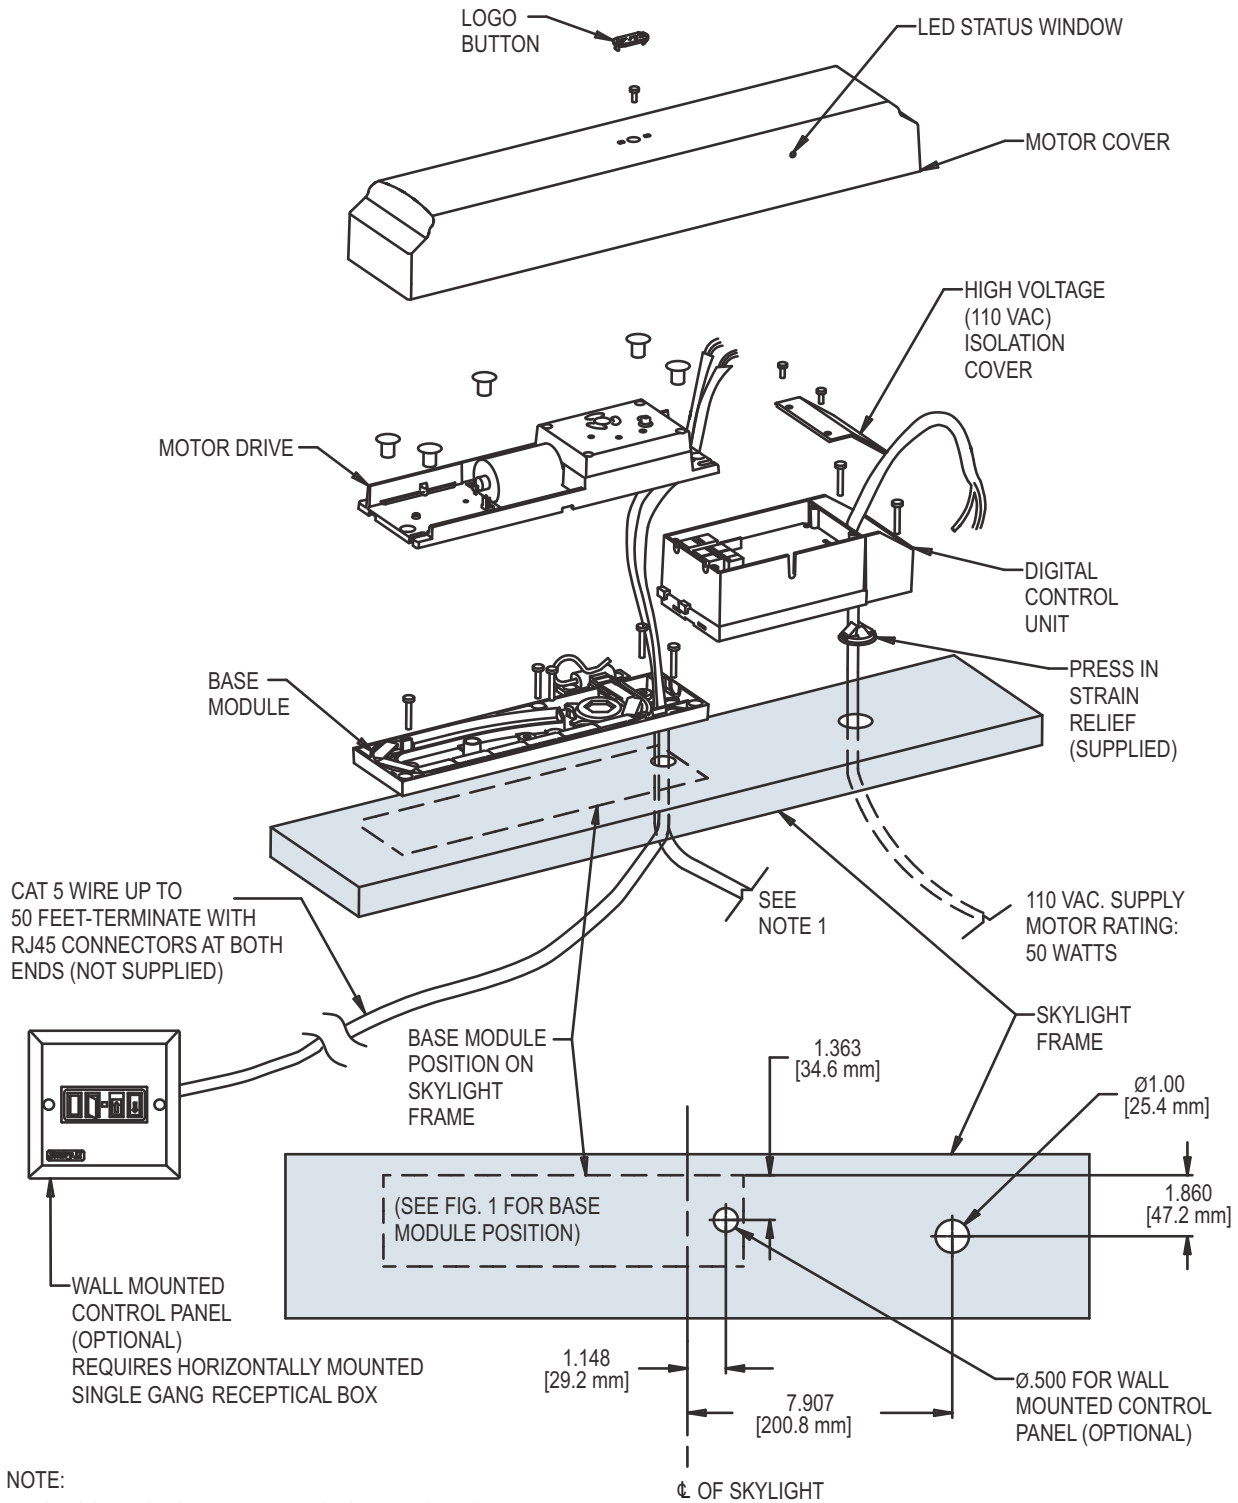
SENTRY II HS MOUNTING ILLUSTRATION
